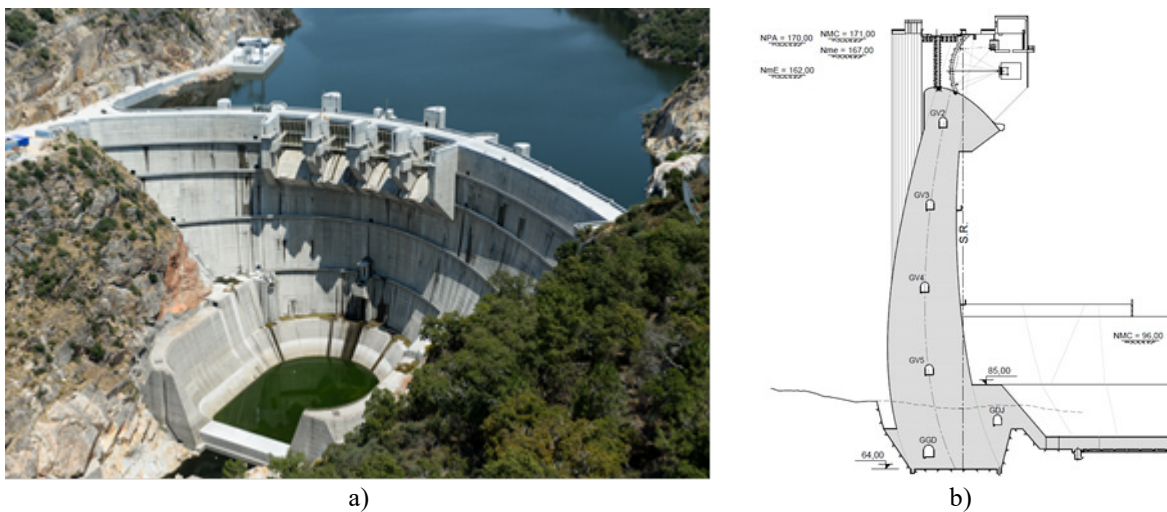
Foz Tua dam, a) aerial view after the first filling of the reservoir, b) cross section through the central block
